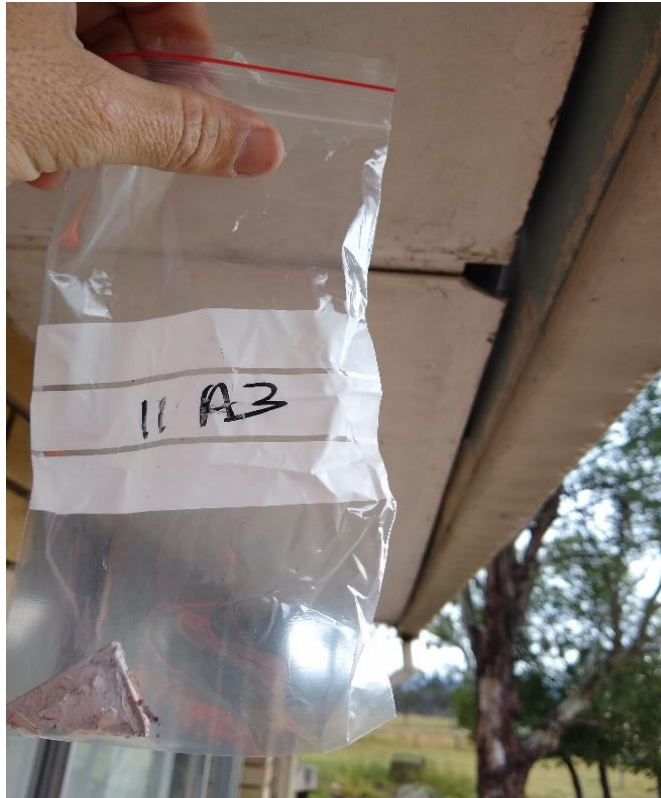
Building 11, exterior, sheeting from eaves, fibre cement sheeting, sample 11A3, asbestos detected by analysis.
